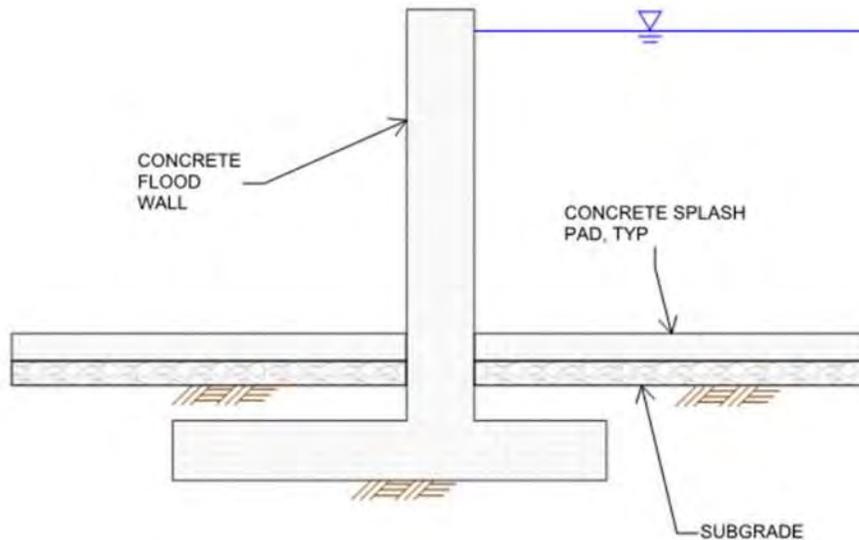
Free-standing Inverted-Tee Floodwall Section
